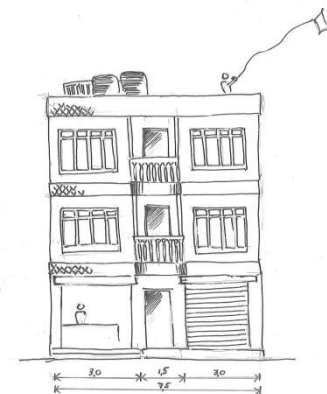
Typical elevation (Shock Safe Nepal group 1).
